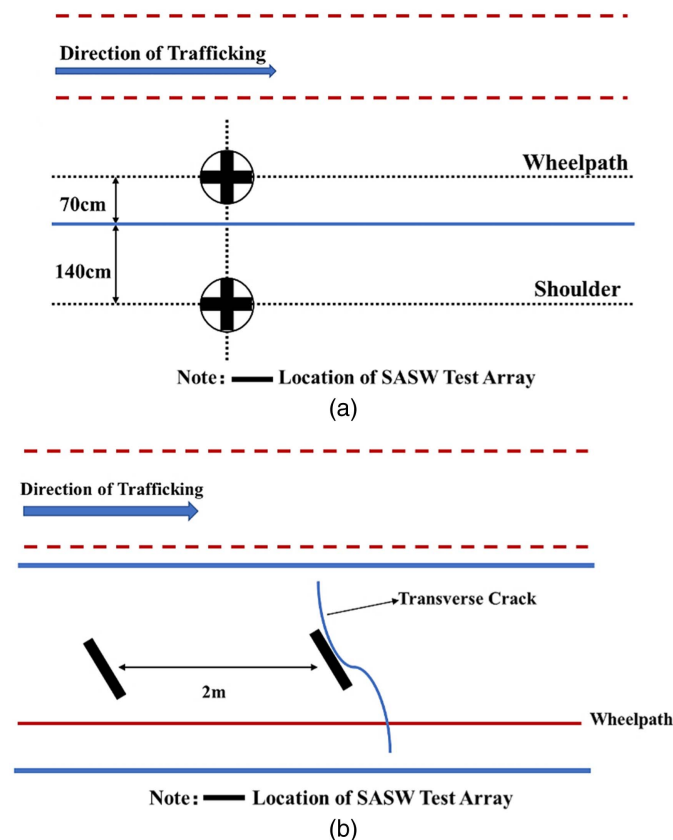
Location of the SASW tests on in-service pavement: (a) test locations at wheel path and shoulder; and (b) test locations at and away from a transverse cracking.
